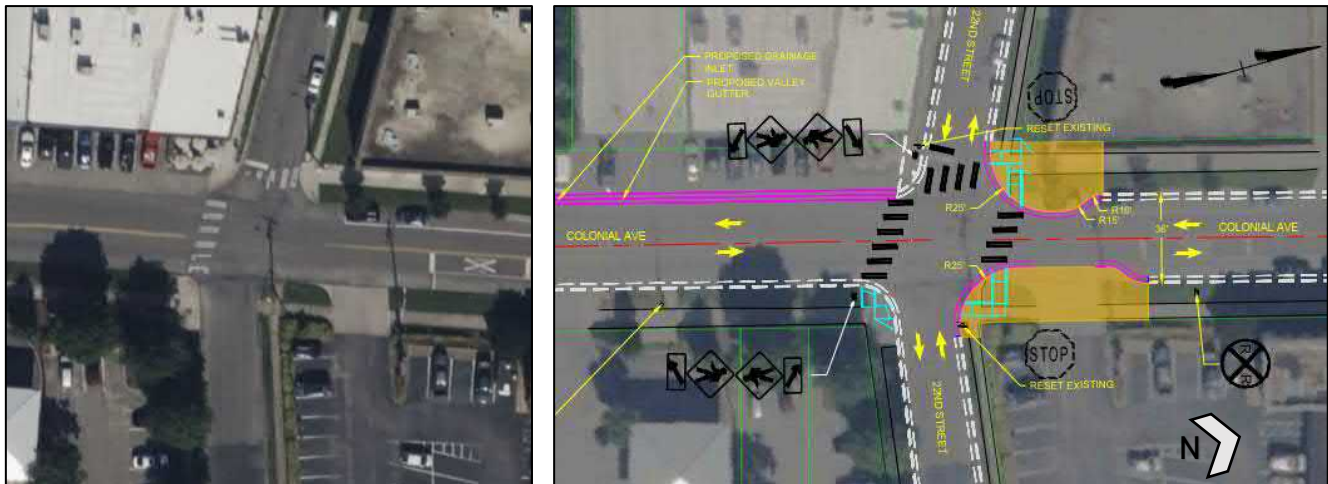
W 22<sup>nd</sup> Street Existing Crosswalks
